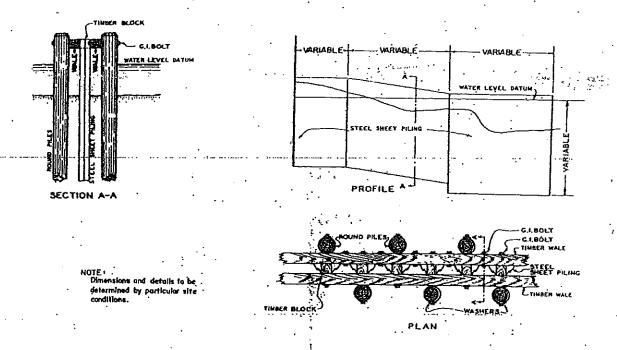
A typical timber-steel sheet-pile groin. (Courtesy U.S. Army Corps of Engineers.)
